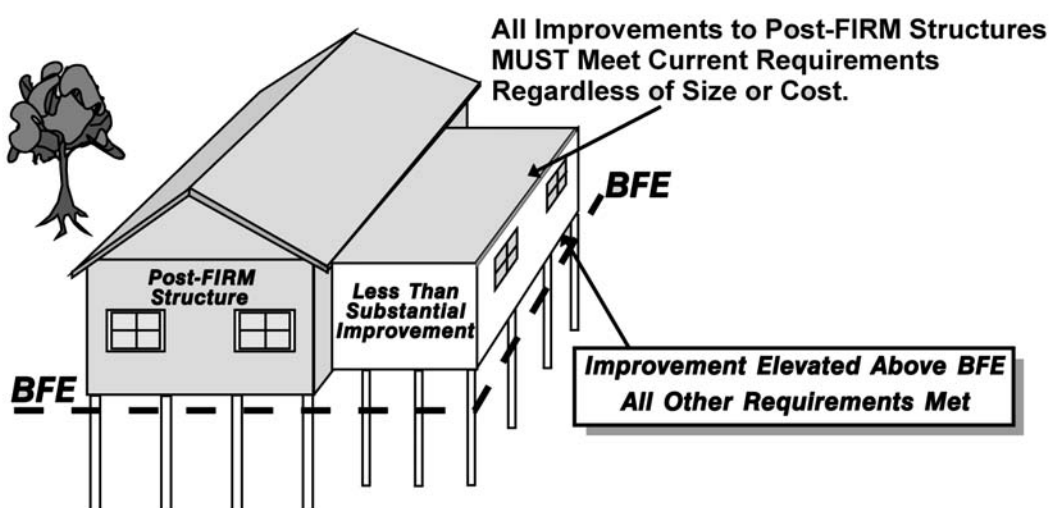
Small additions to post-FIRM buildings must be elevated.
